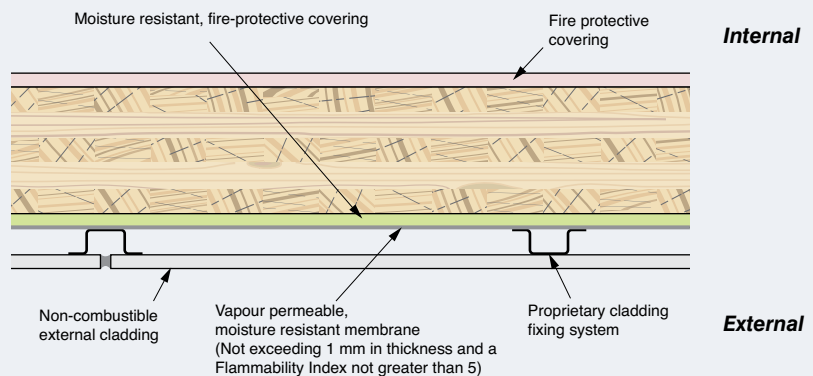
Fire-protected massive timber external wall with external lightweight cladding.
